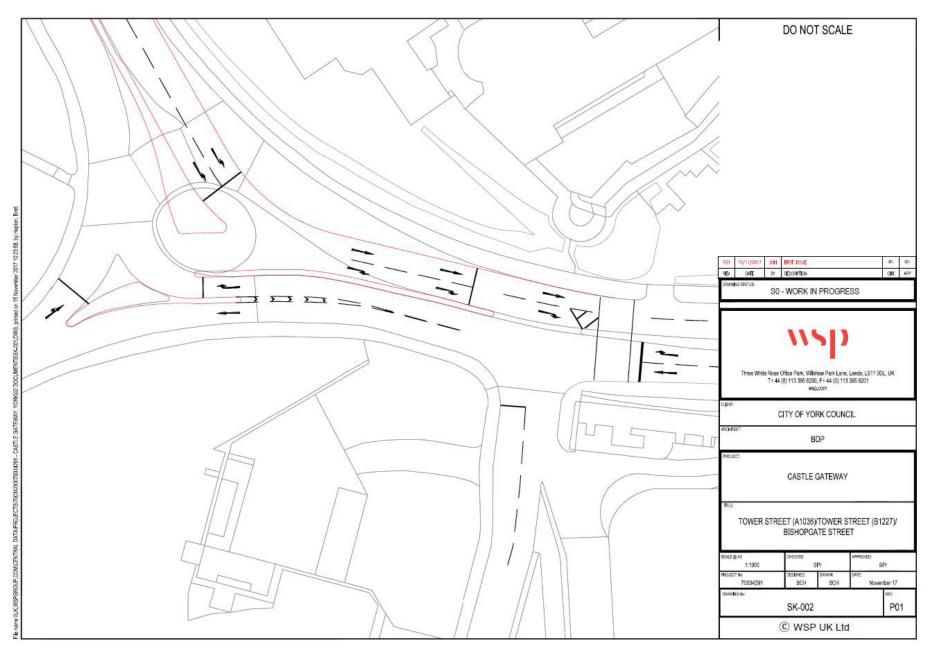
Skeldergate Bridge / Tower Street Junction Layout
